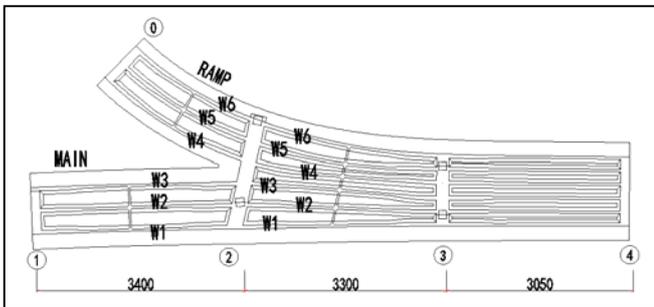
FIGURE I. THE PLAN DRAWING OF SPECIAL-SHAPED BOX GIRDER (UNIT: CM)
